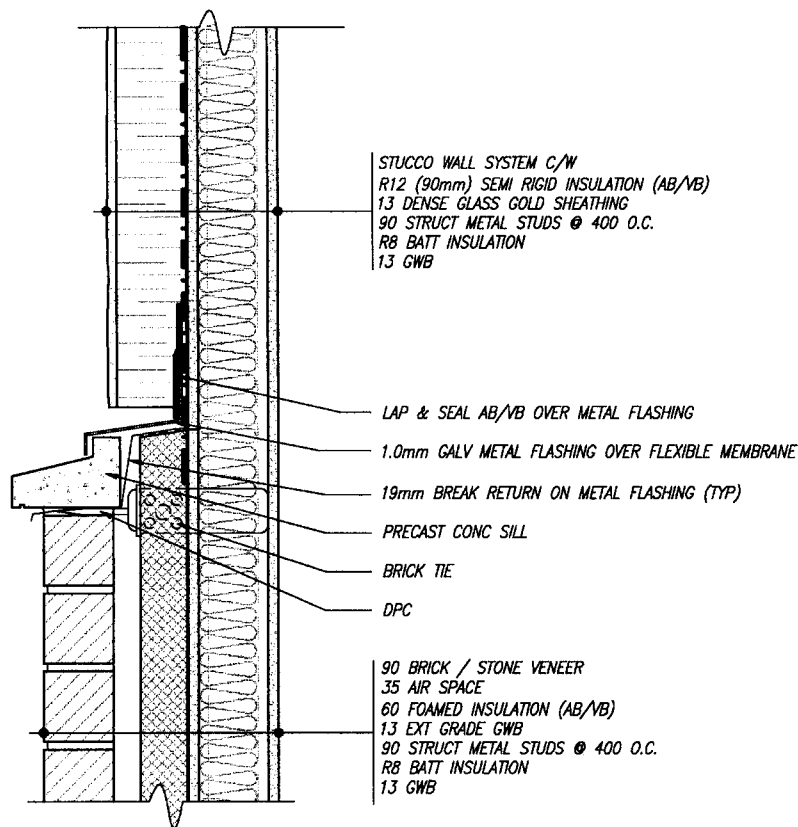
As-Designed Window Sealing Detail – EIFS Wall
